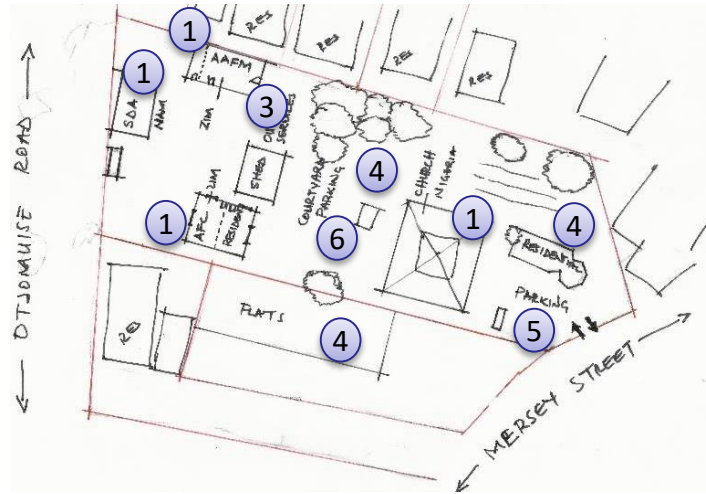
Dutch Reformed Church center sketch site layout plan (Author 2021)
